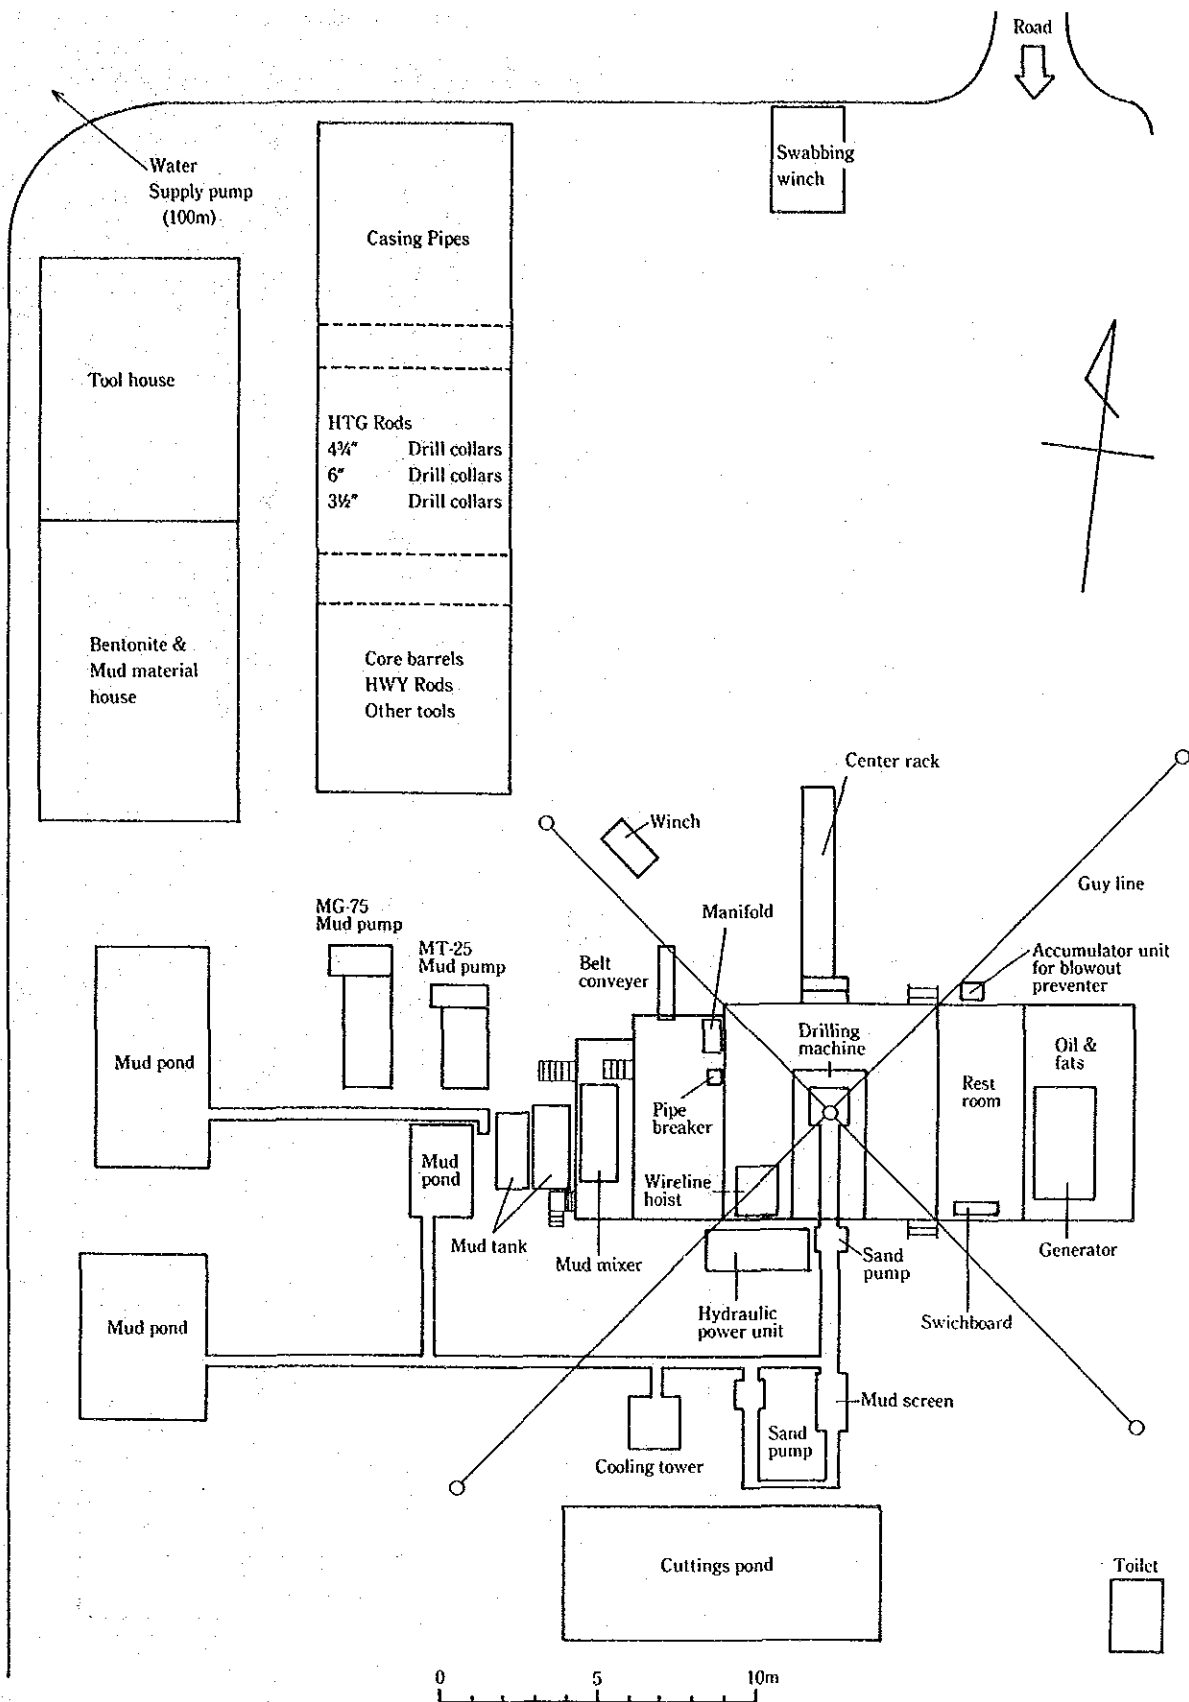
Lay out of Drilling Site of GTE-7
